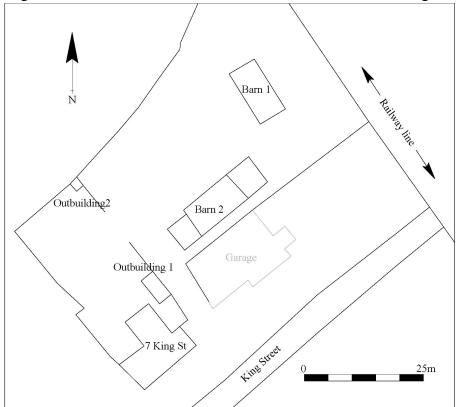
Site plan with existing buildings Building titles used for the purposes of this report only
